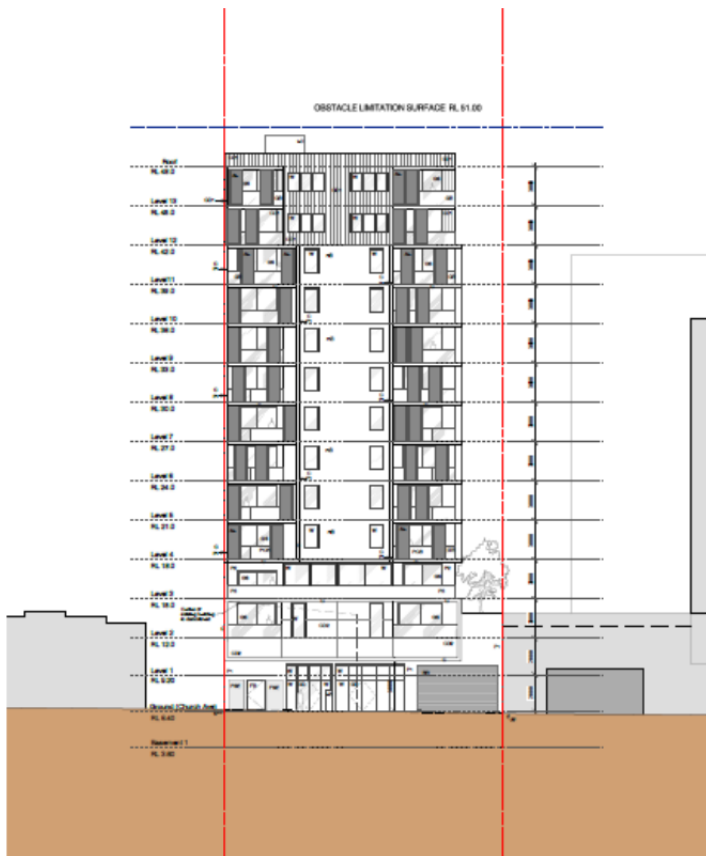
Proposed Northern Elevation (View from Church Avenue)
